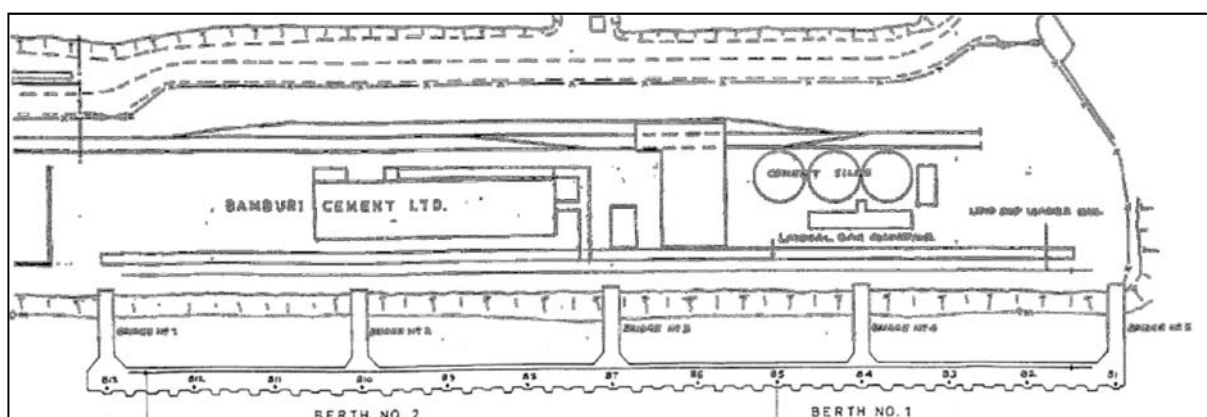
General Layout Plan of Mbaraki Wharf
